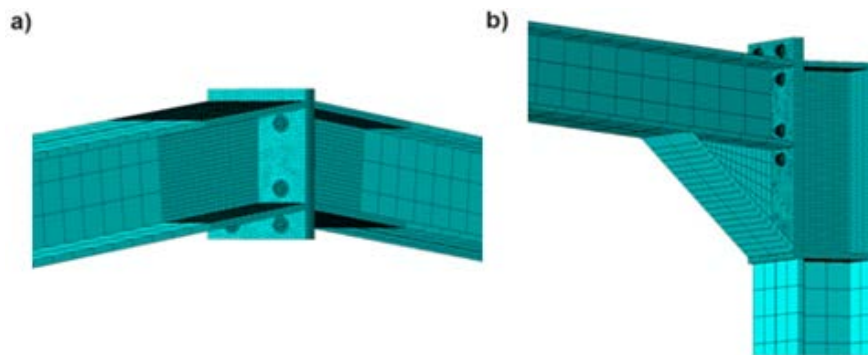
Details of bolted connection models with a FE mesh: (a) the apex connection, (b) the column-to-rafter connection
